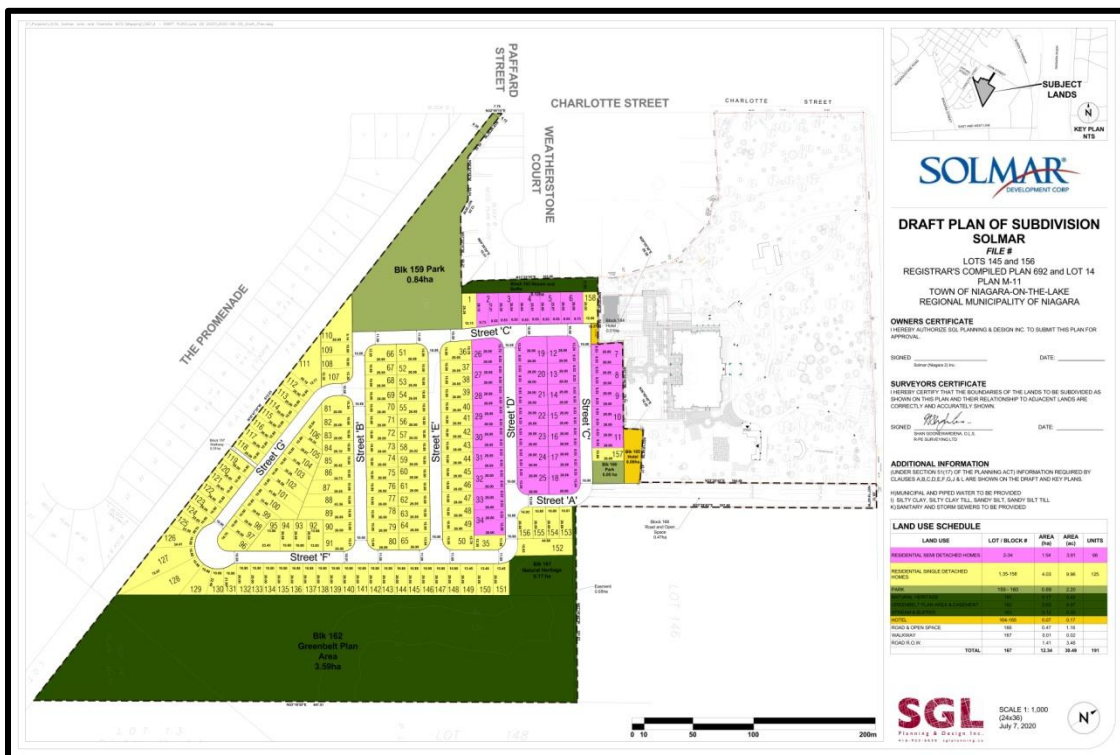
588 Charlotte Street & 200 John Street, Draft Plan of Subdivision (APPENDIX III)
